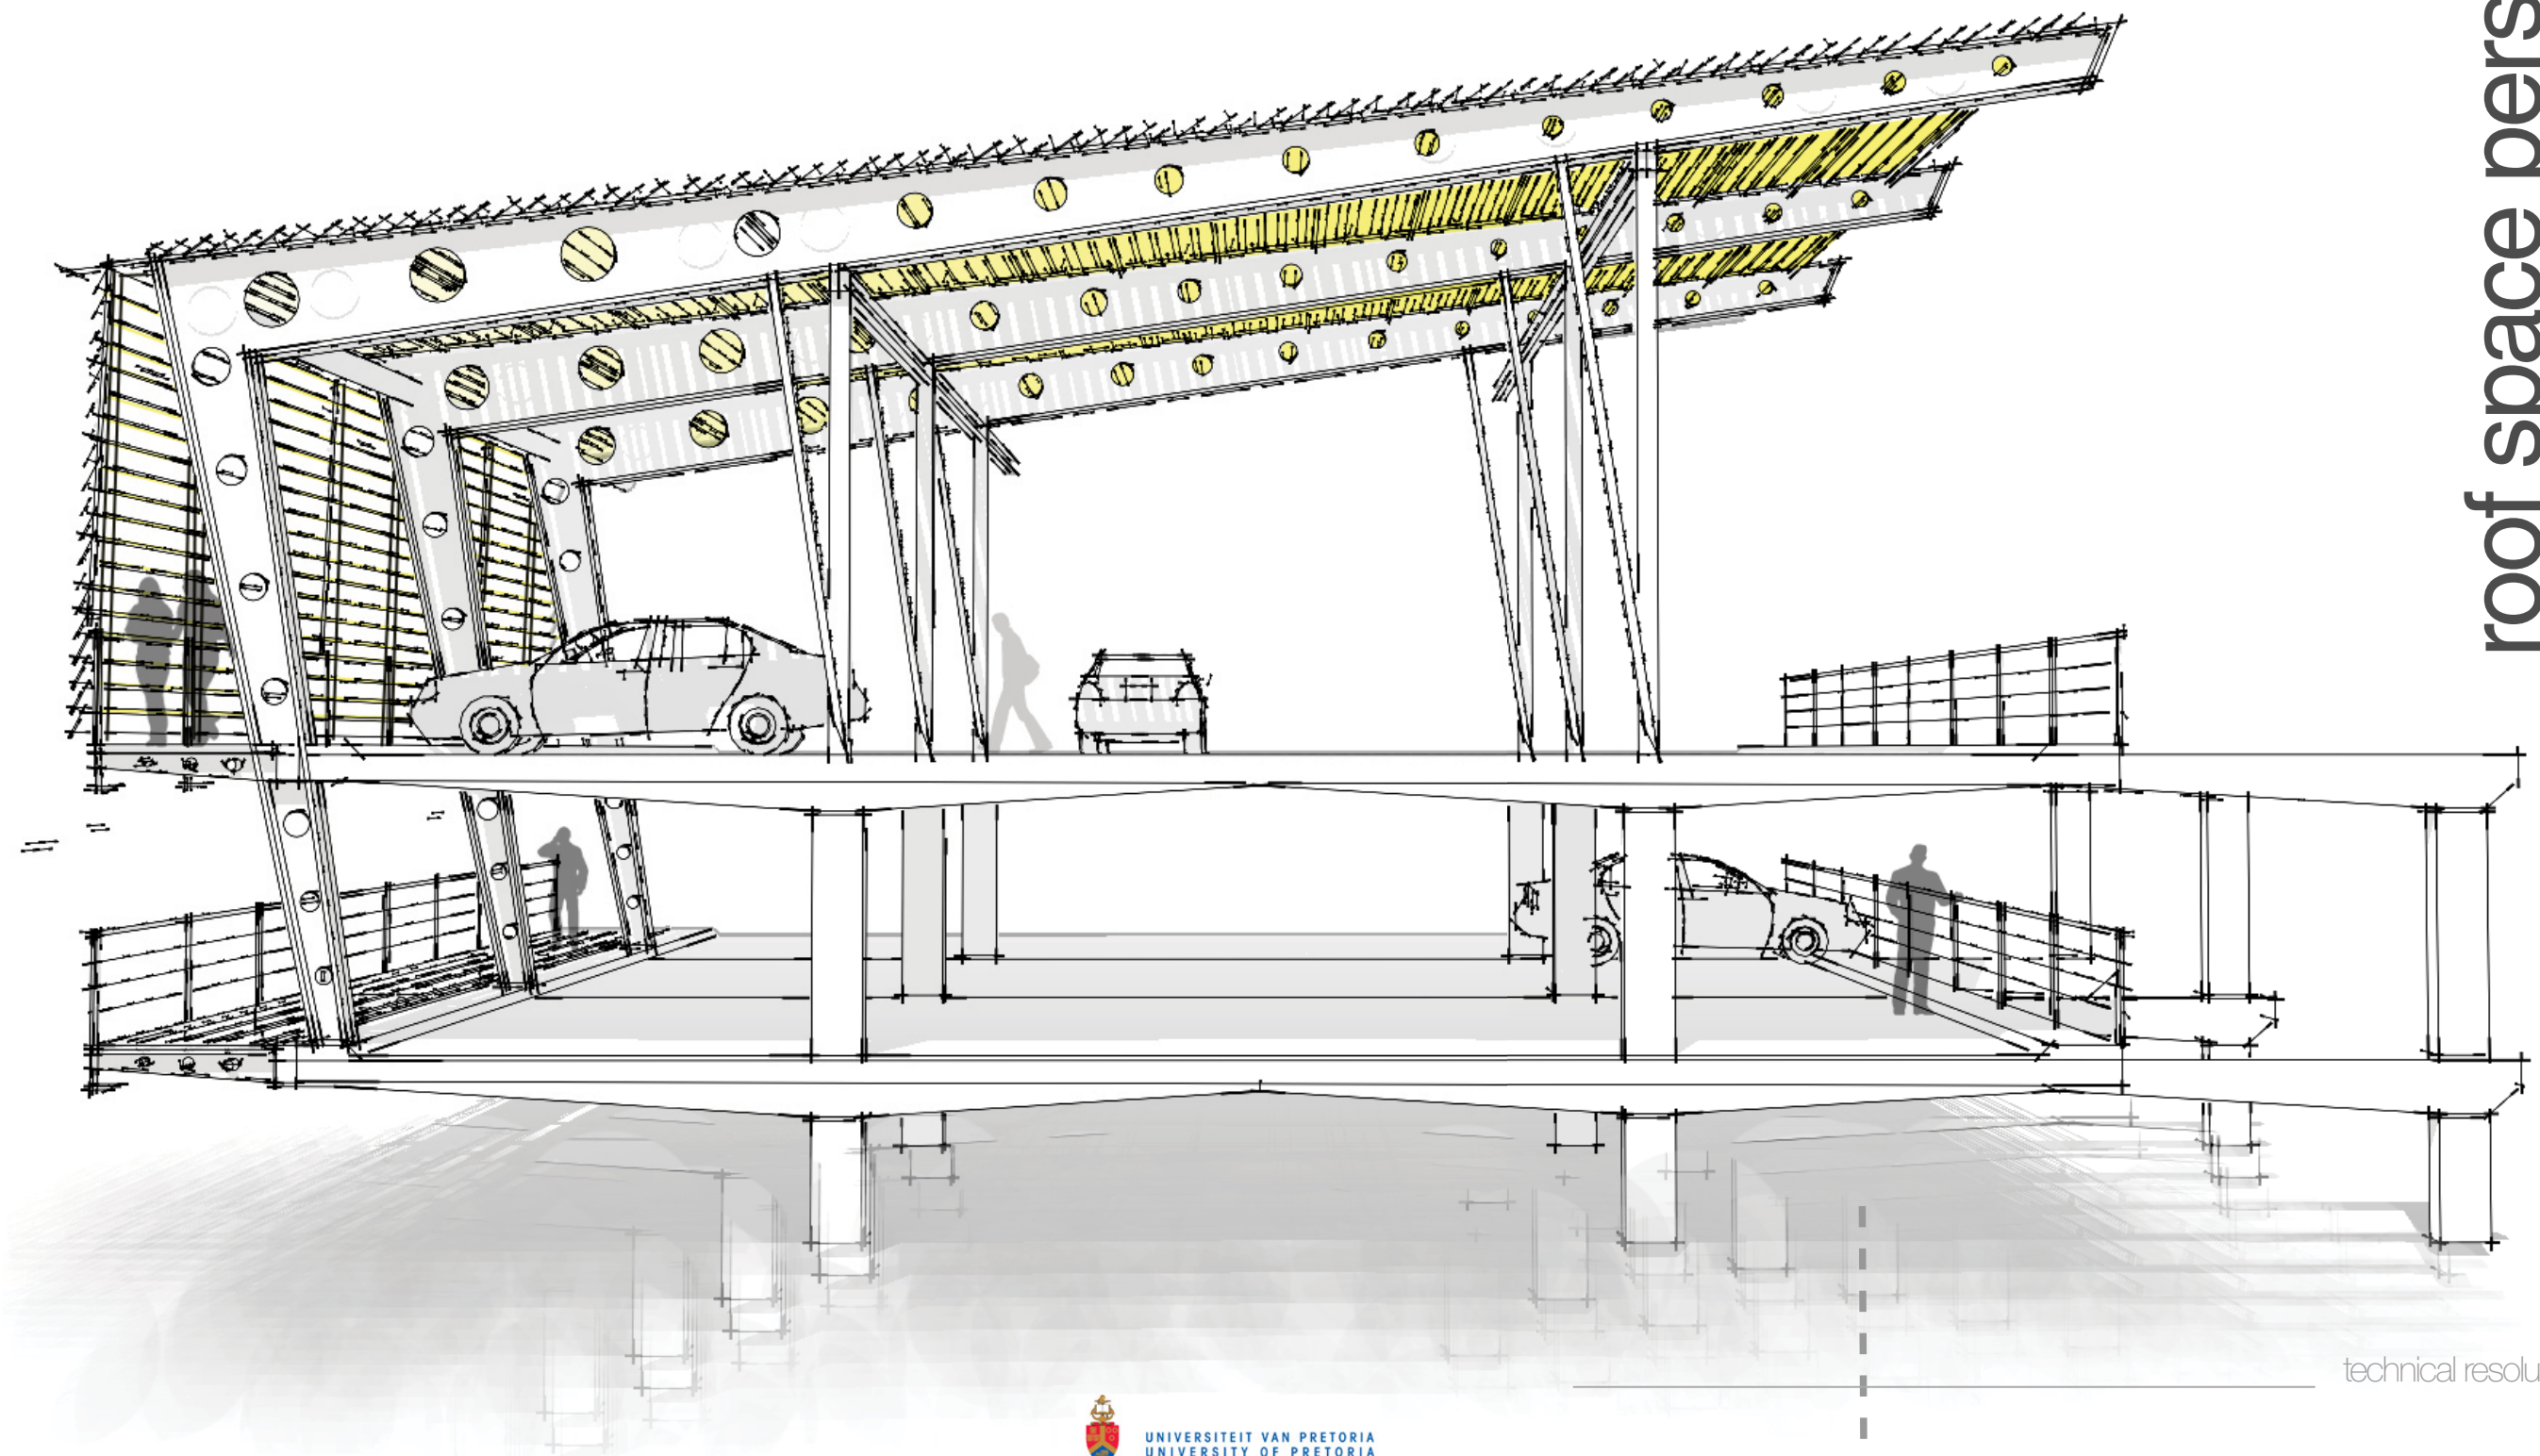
19.] Castellated beam roof structure @ 8000mm centres with infill bracing fixed to steel I-sections on concrete slab.
